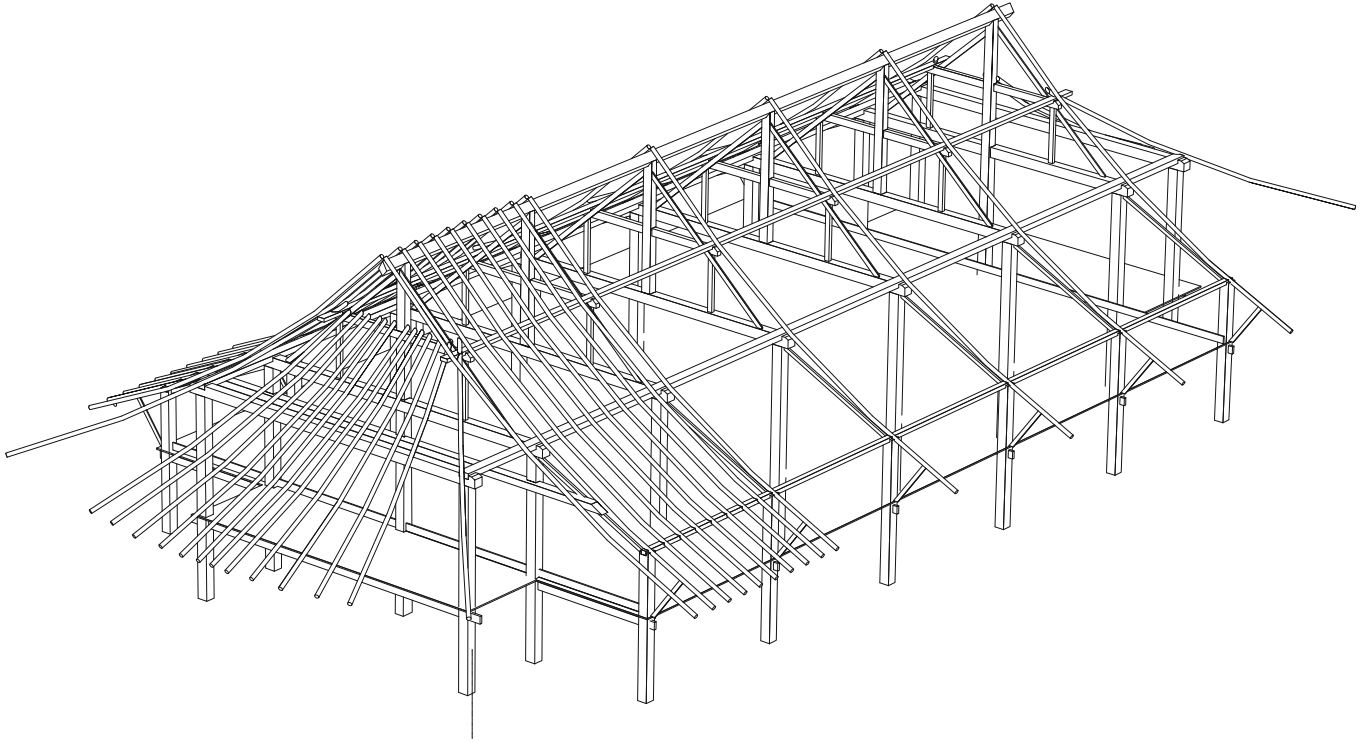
Axonometric view of a long house at the village of Baan Ngek showing roof shaping element made of bamboo
